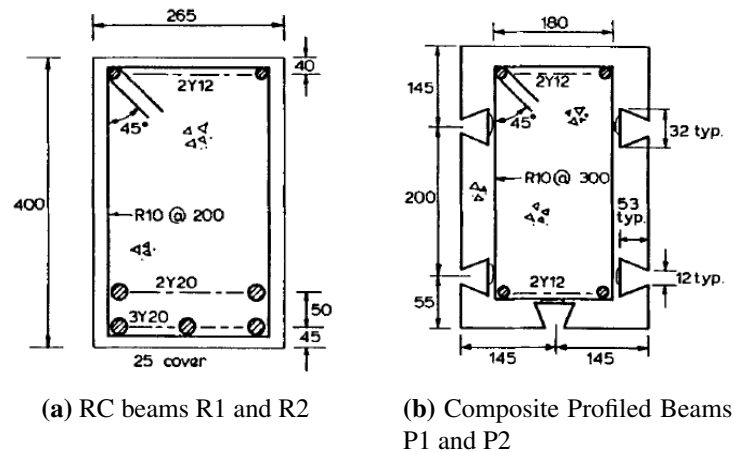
Specimens cross-section tested by Uy and Bradford (1995a)
